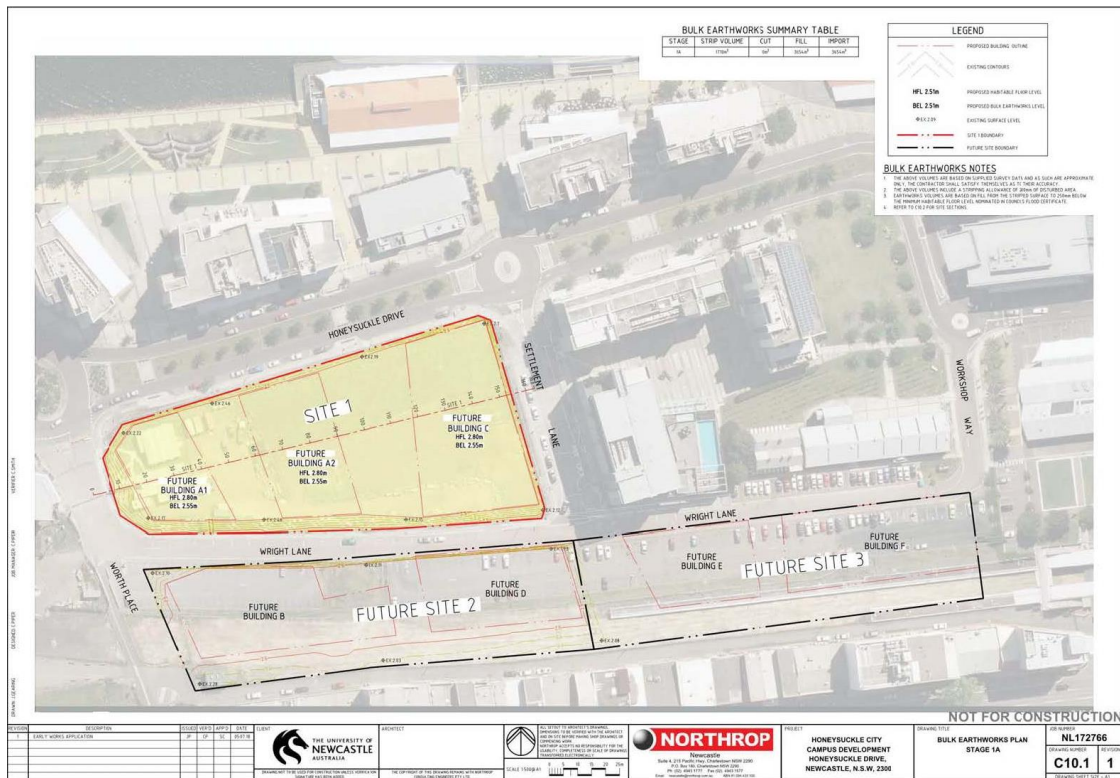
ENABLING WORKS PROPOSED ACTIVITY—SITE FILL PLAN (SOURCE: NORTHROP 2018)
